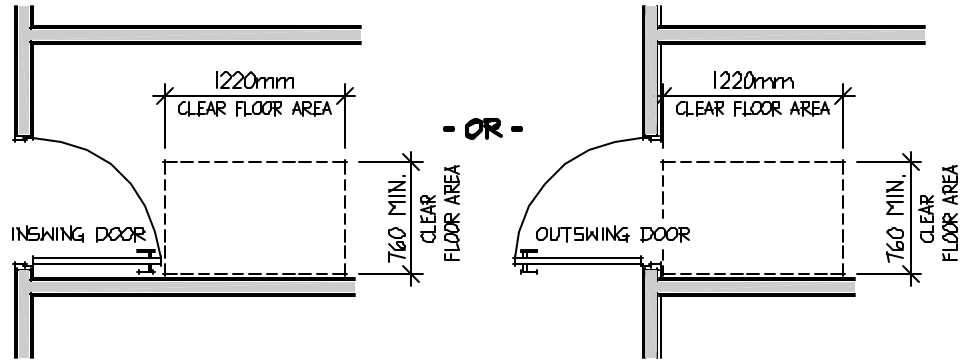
CLEAR FLOOR AREA BEYOND SWING OF DOOR
